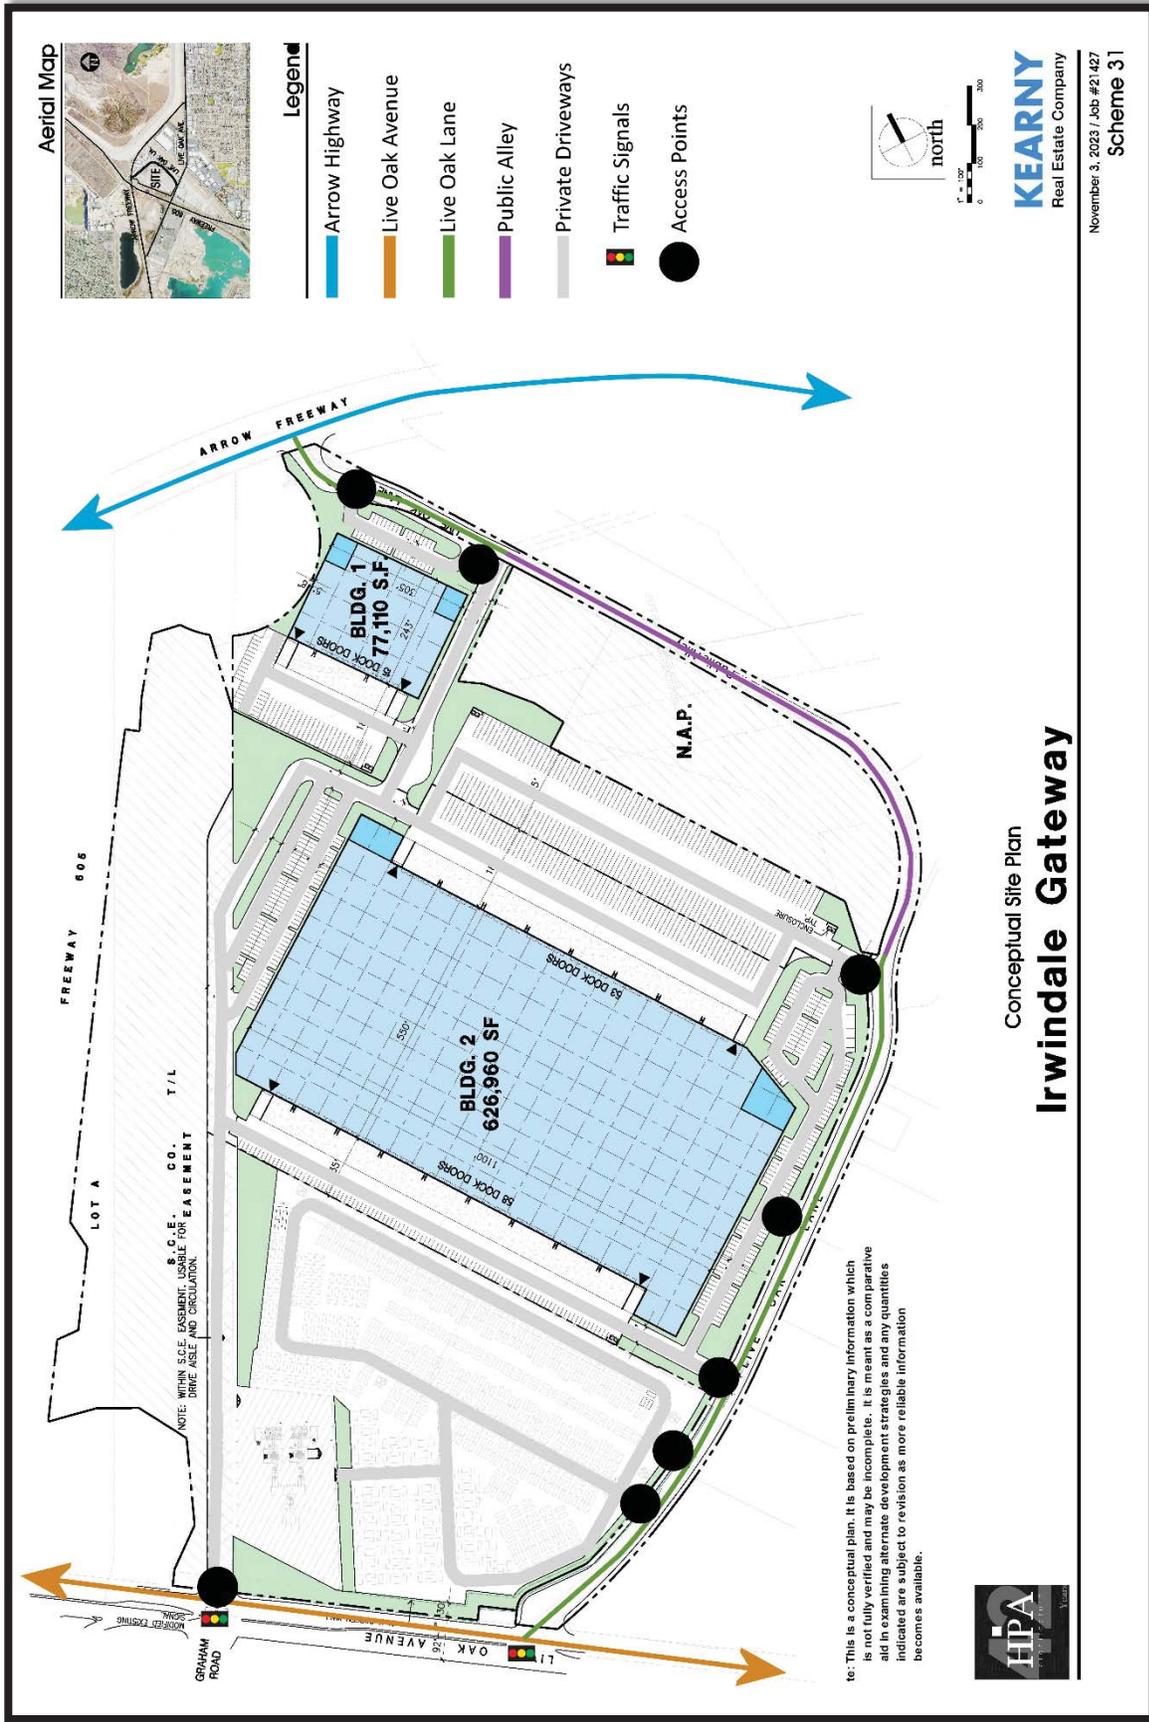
CONCEPTUAL CIRCULATION PLAN WITH BESS
